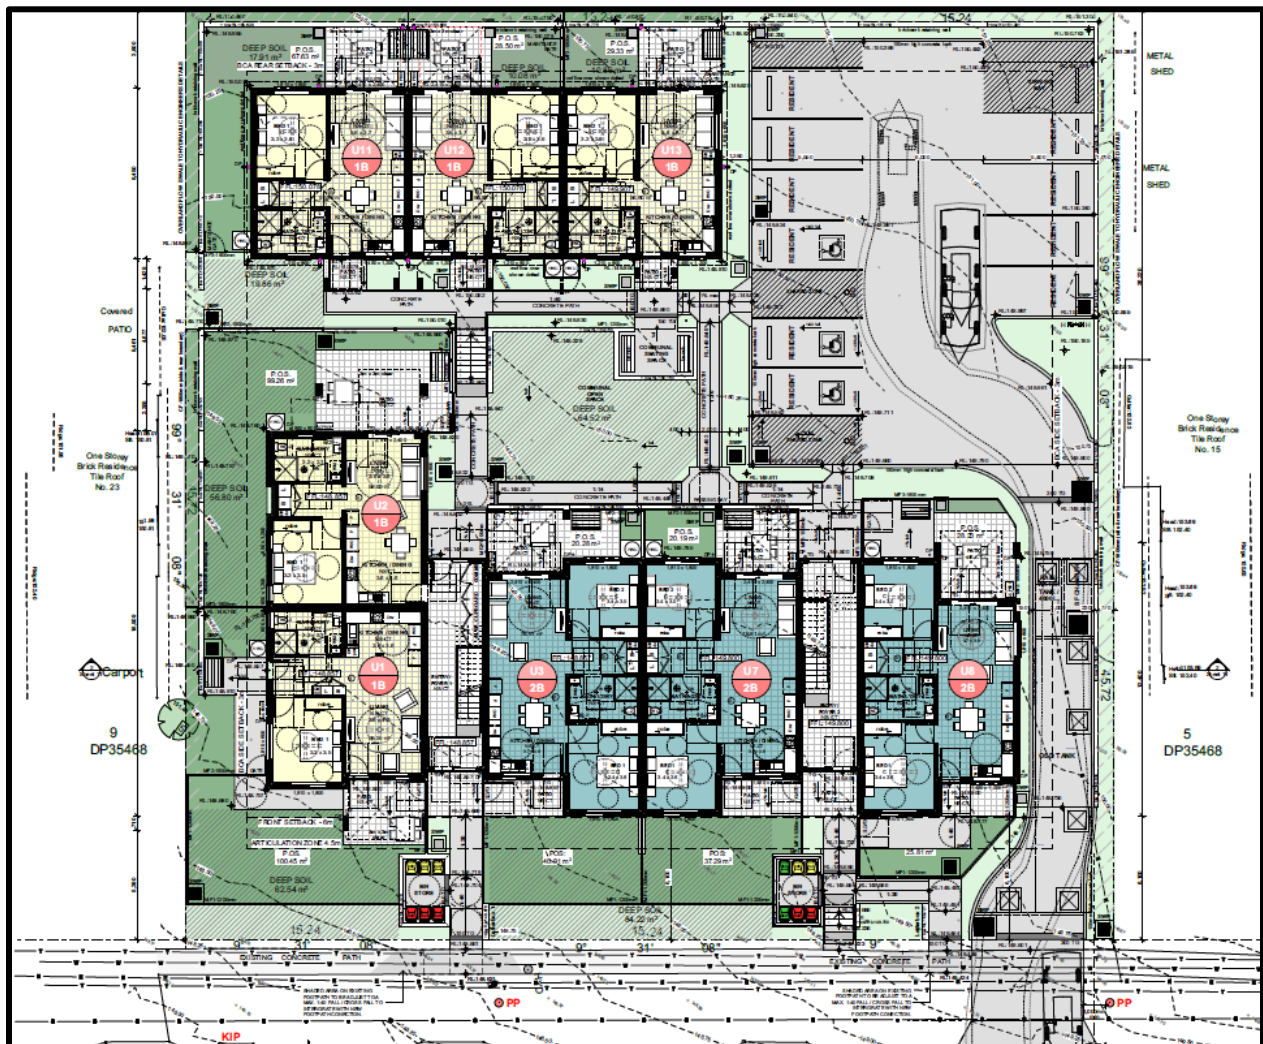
Proposed Ground Floor Plan (Source DTA Architects)
